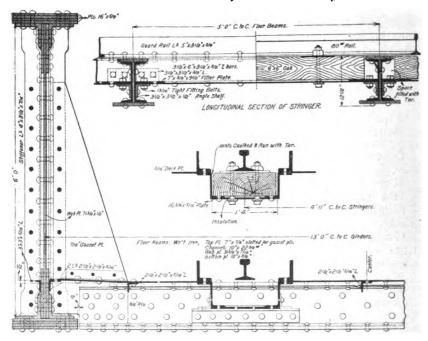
SECTIONS OF BRIDGE FLOOR, C. & N. W. RY.
